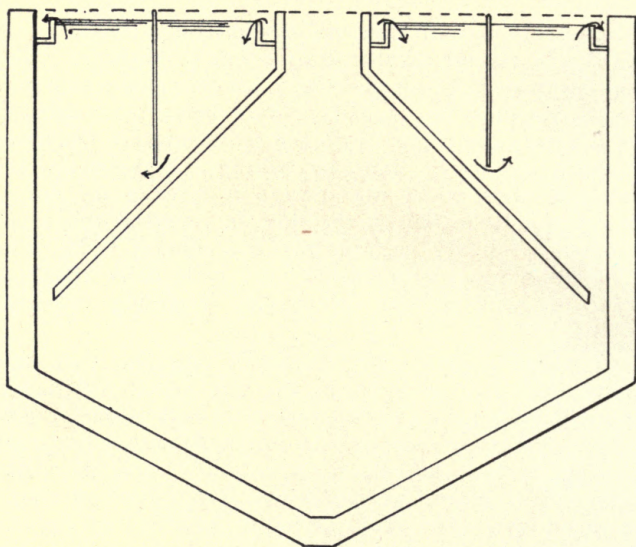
PLAN SUBMITTED FOR IMHOFF TANK.
